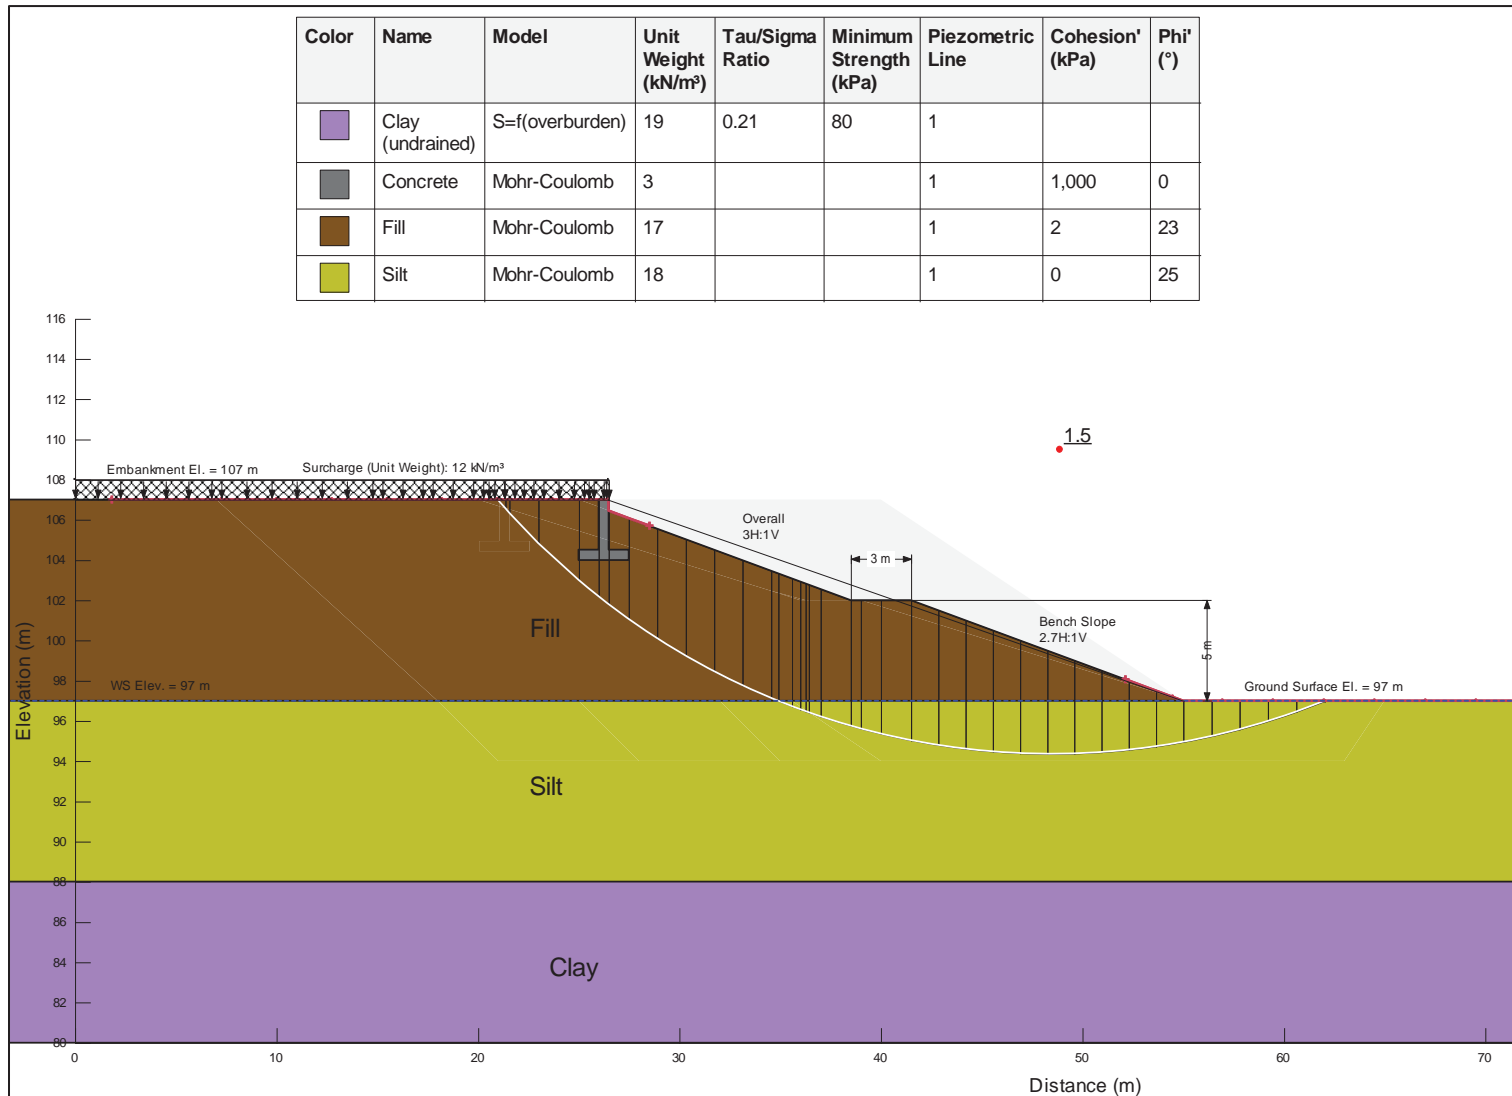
Jane St. North Embankment End of Construction (Undrained) Case A1
